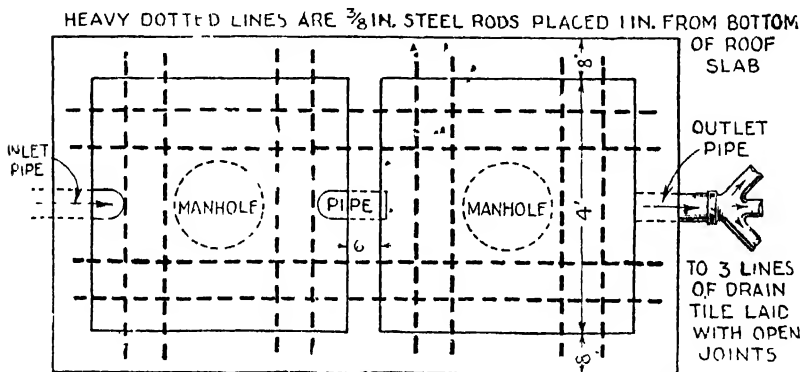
,780 - Septic tank; plan showing location of reinforcing rods.
